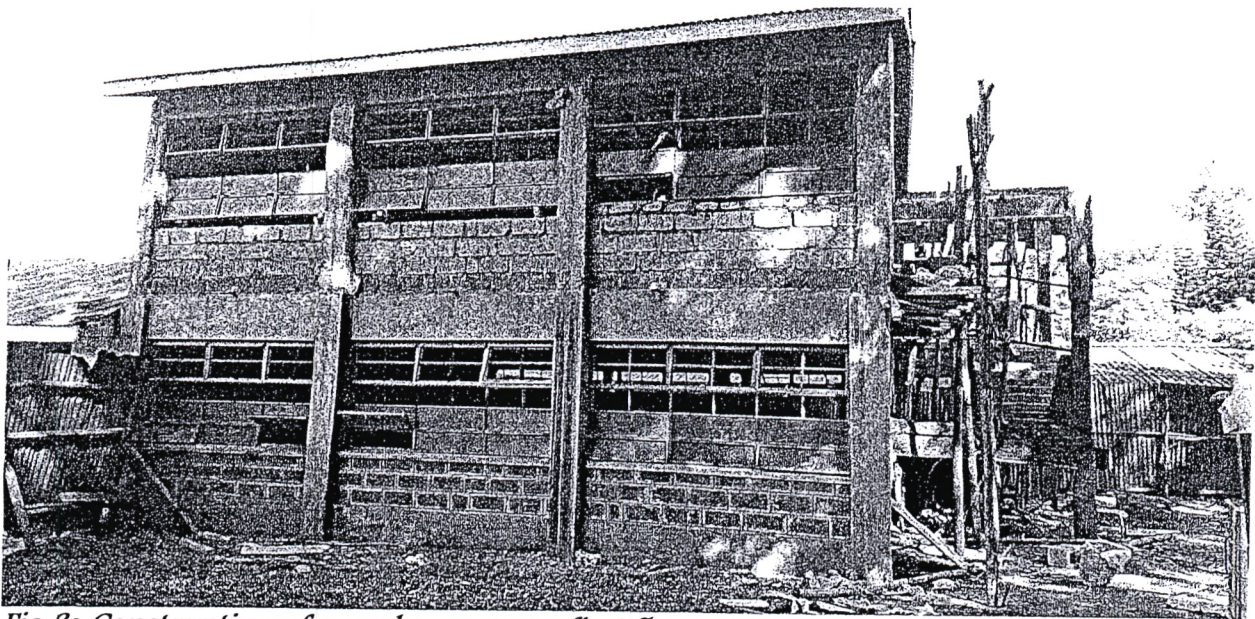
Construction of one classroom on first floor at State House Girls Secondary School.
